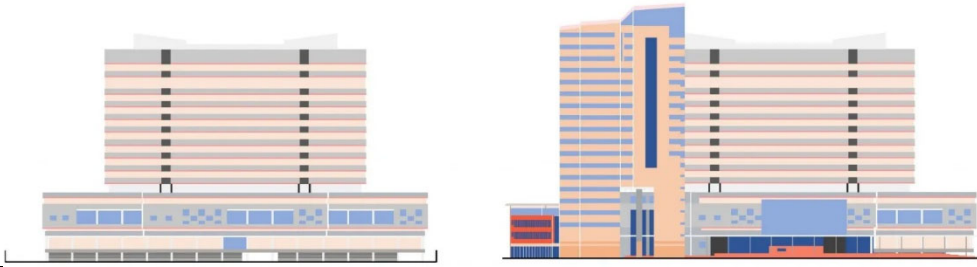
Front view of the Palace of Justice after being delivered in 1973 (left picture) and the front view of the building after being renovated and expanded with a new ground floor and an office tower in the nineties (right picture)(Sebregts, N.D.)
